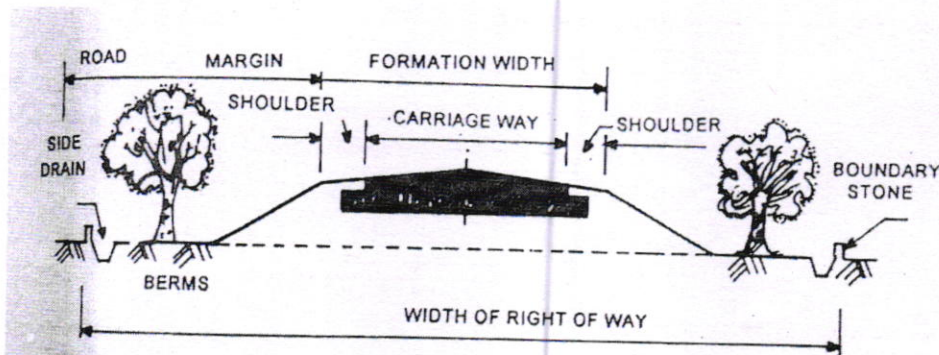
CROSS SECTION OF ROAD IN EMBANKMENT
